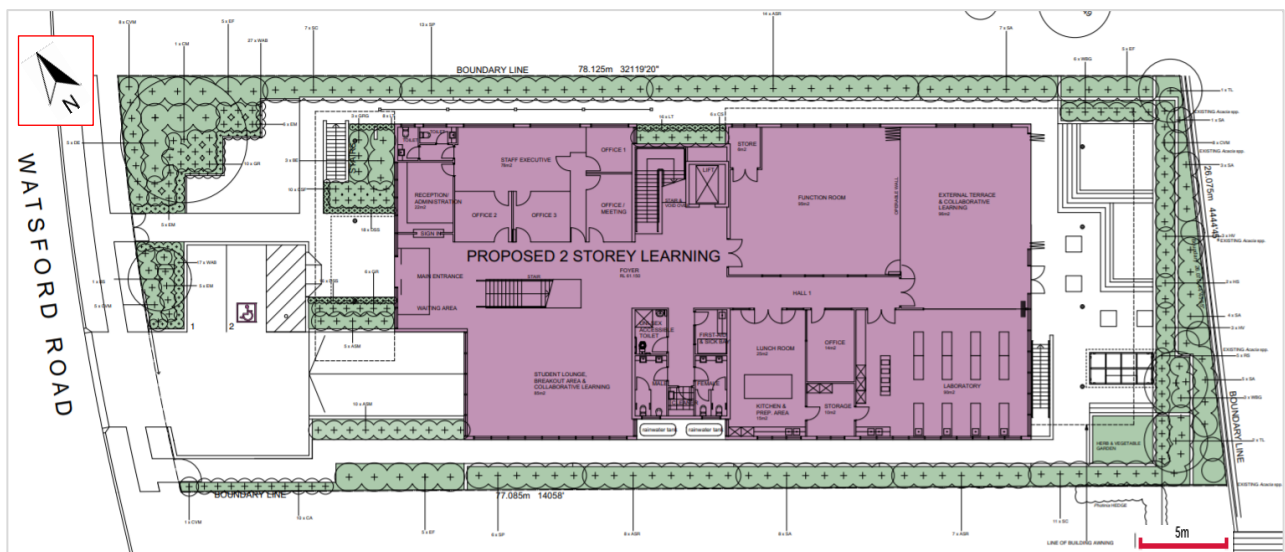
Landscaping Plan (Source: Applicant's EIS)
